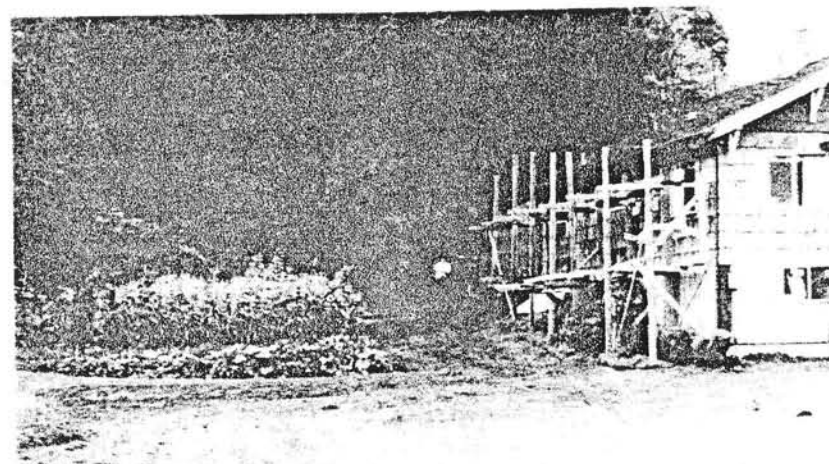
Location of excavations shown by figures between the house and garden at the Ivy Station site.
